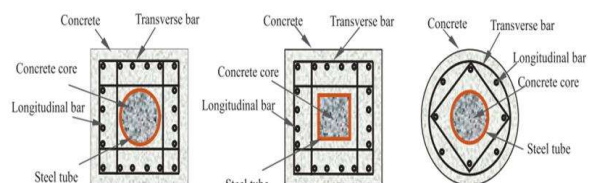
Commonly used cross sections of concrete-encased CFST columns.
